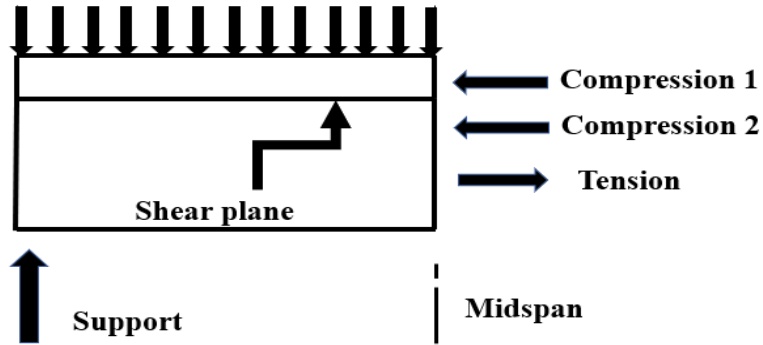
Equilibrium for concrete composite beam under compression load at web
